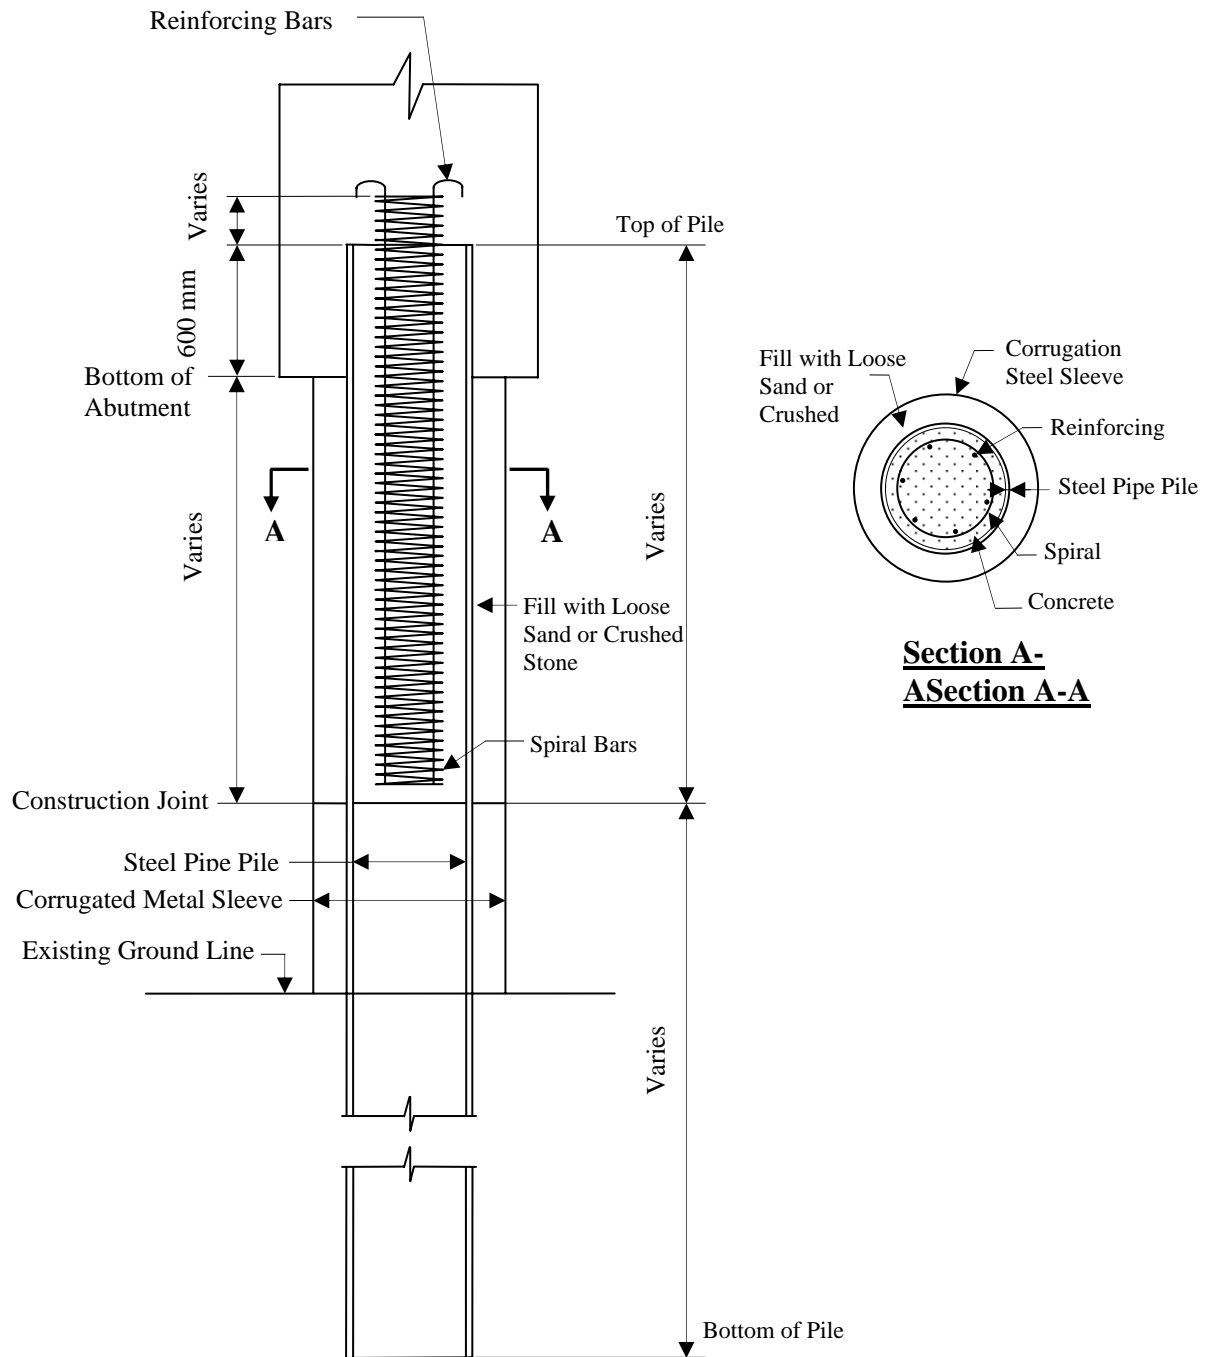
Steel Pipe Pile Filled with Concrete Details (Courtesy of NJDOT)
